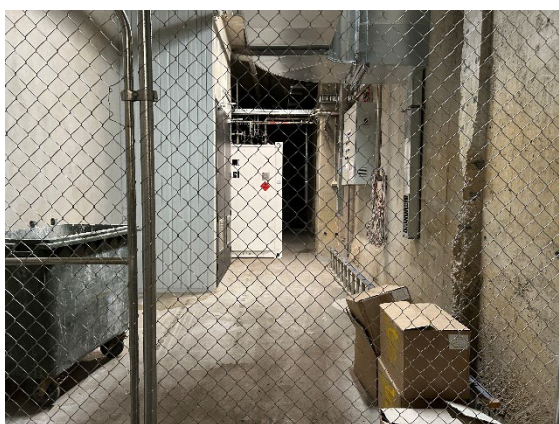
Ground Floor Loading Dock – Diesel Area, 19,000L Diesel Tank.
